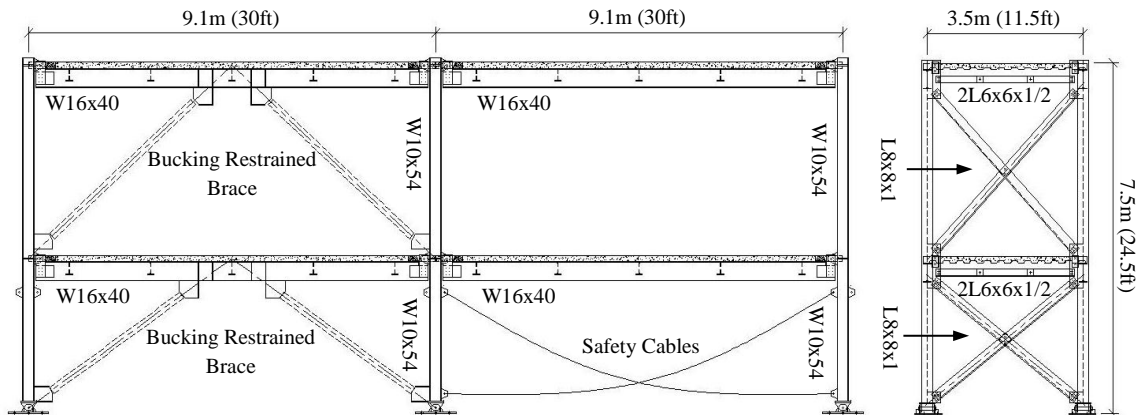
Test-bed Structure: (left) longitudinal view, (right) transverse view
